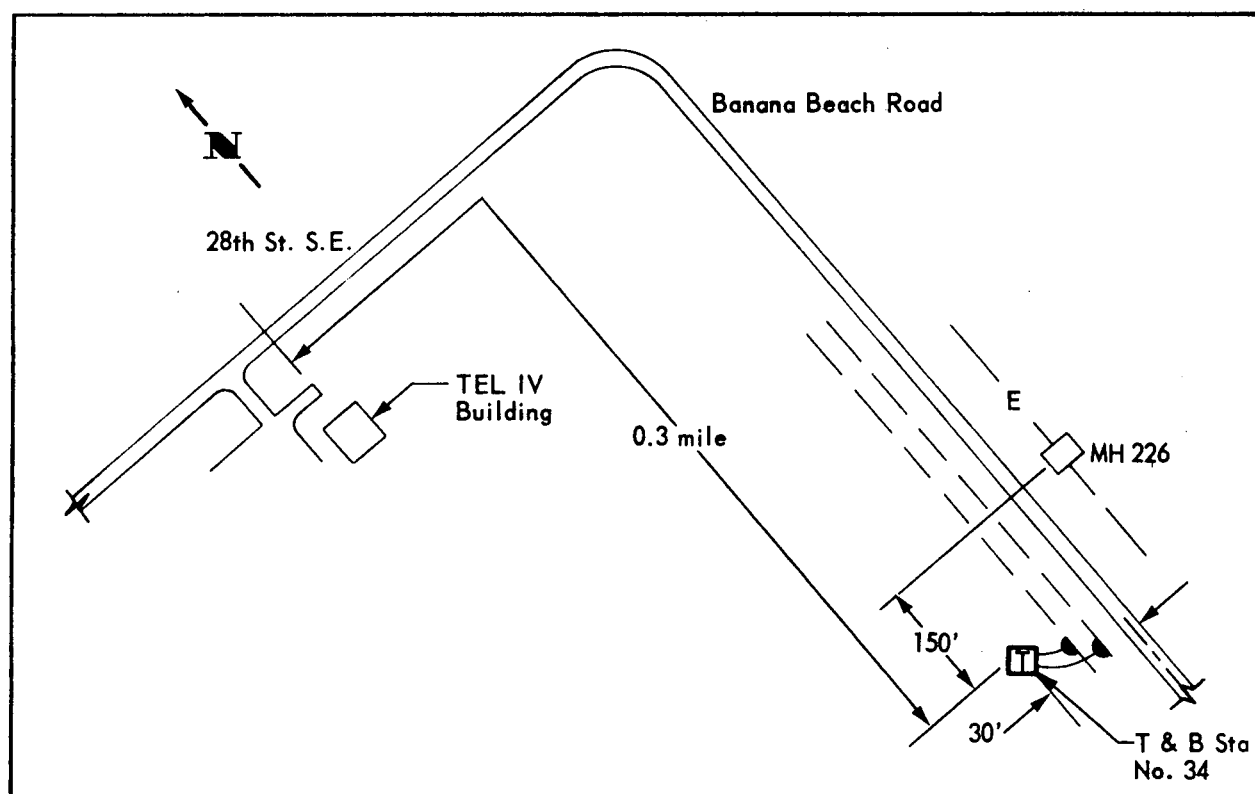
Test and Bond Station No. 34 Equipment Locator
